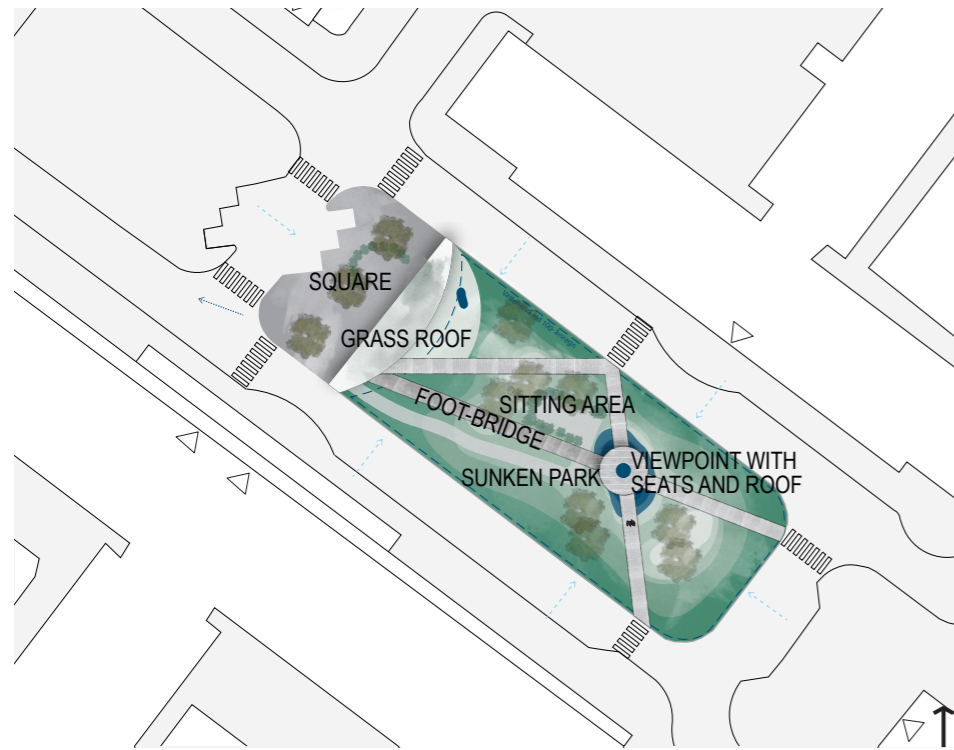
FIGURE VI. ILLUSTRATION PLAN OF DETENTION STORAGE AREA 3 - ENTRÉTROGET.
